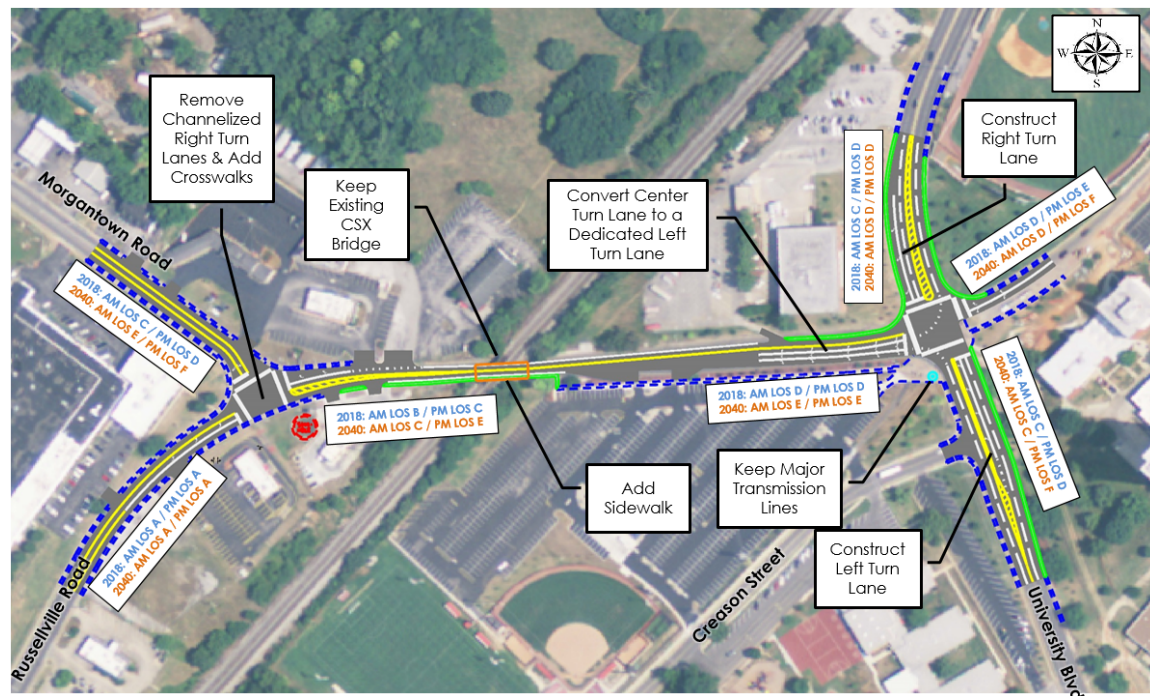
Intersection Improvements and Sidewalk on Russellville Road
